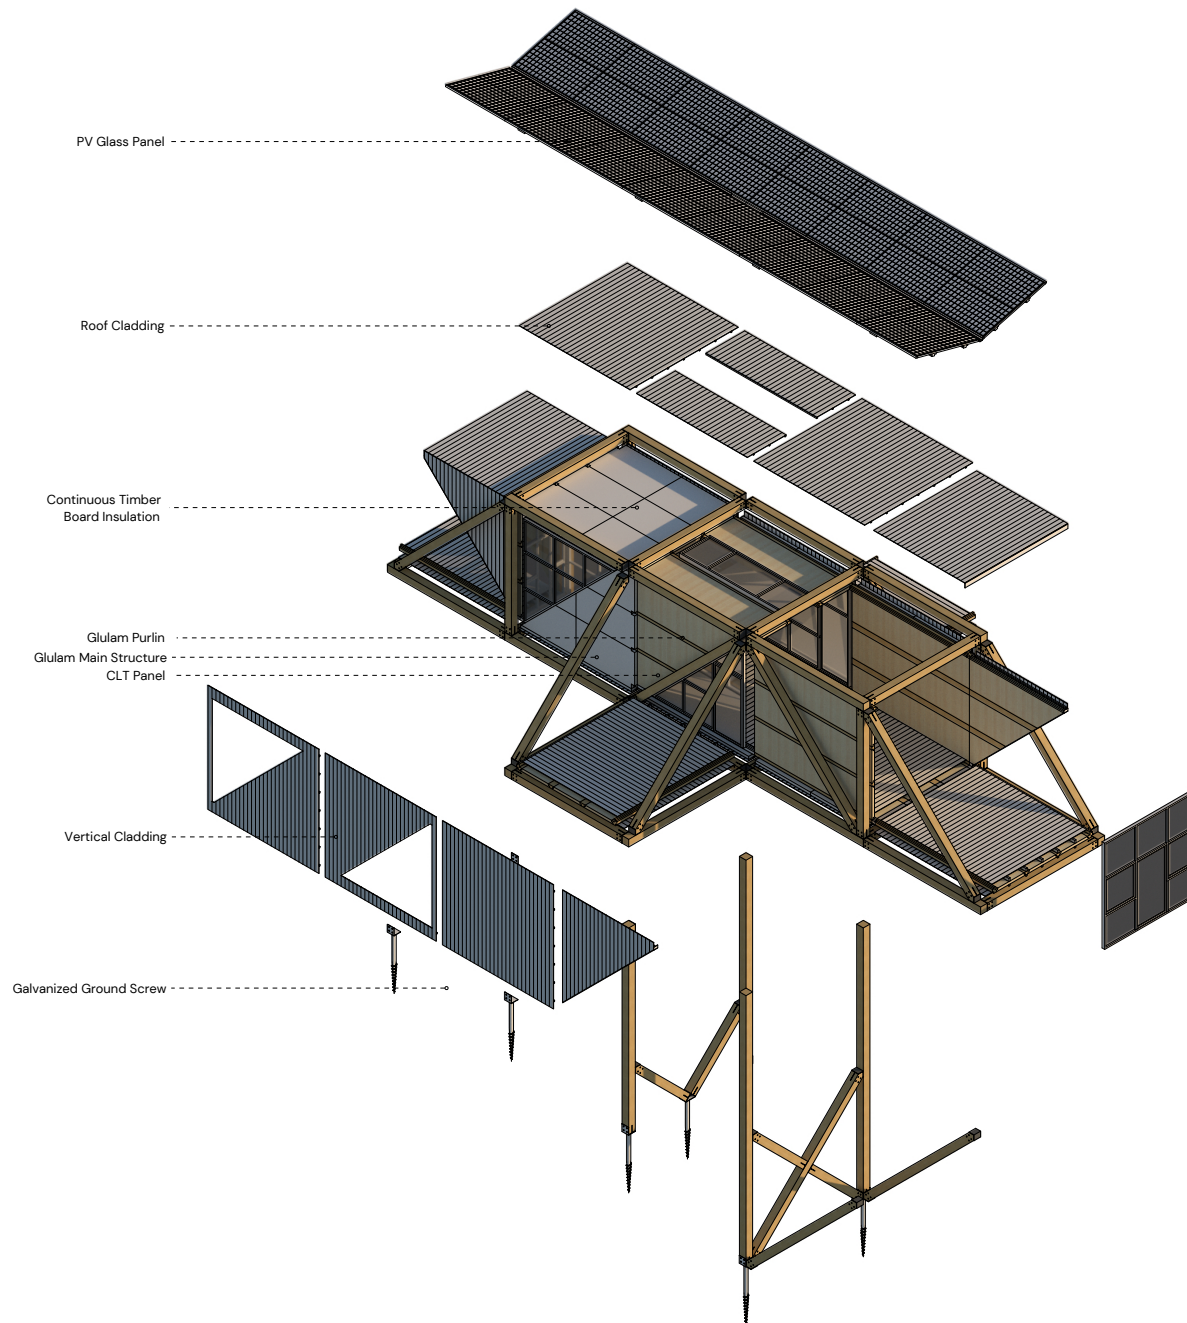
Prefab Mass Timber ADU Structure, by the Author.
